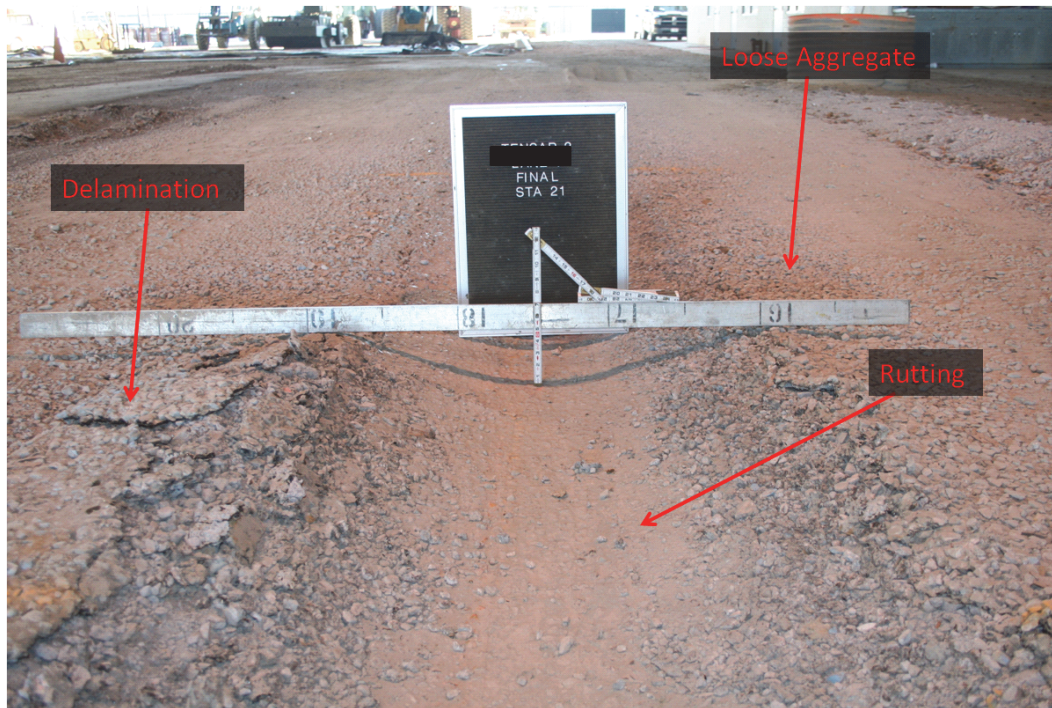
Cracking and delamination of a surface-treated airfield pavement (Edwards 2012).
